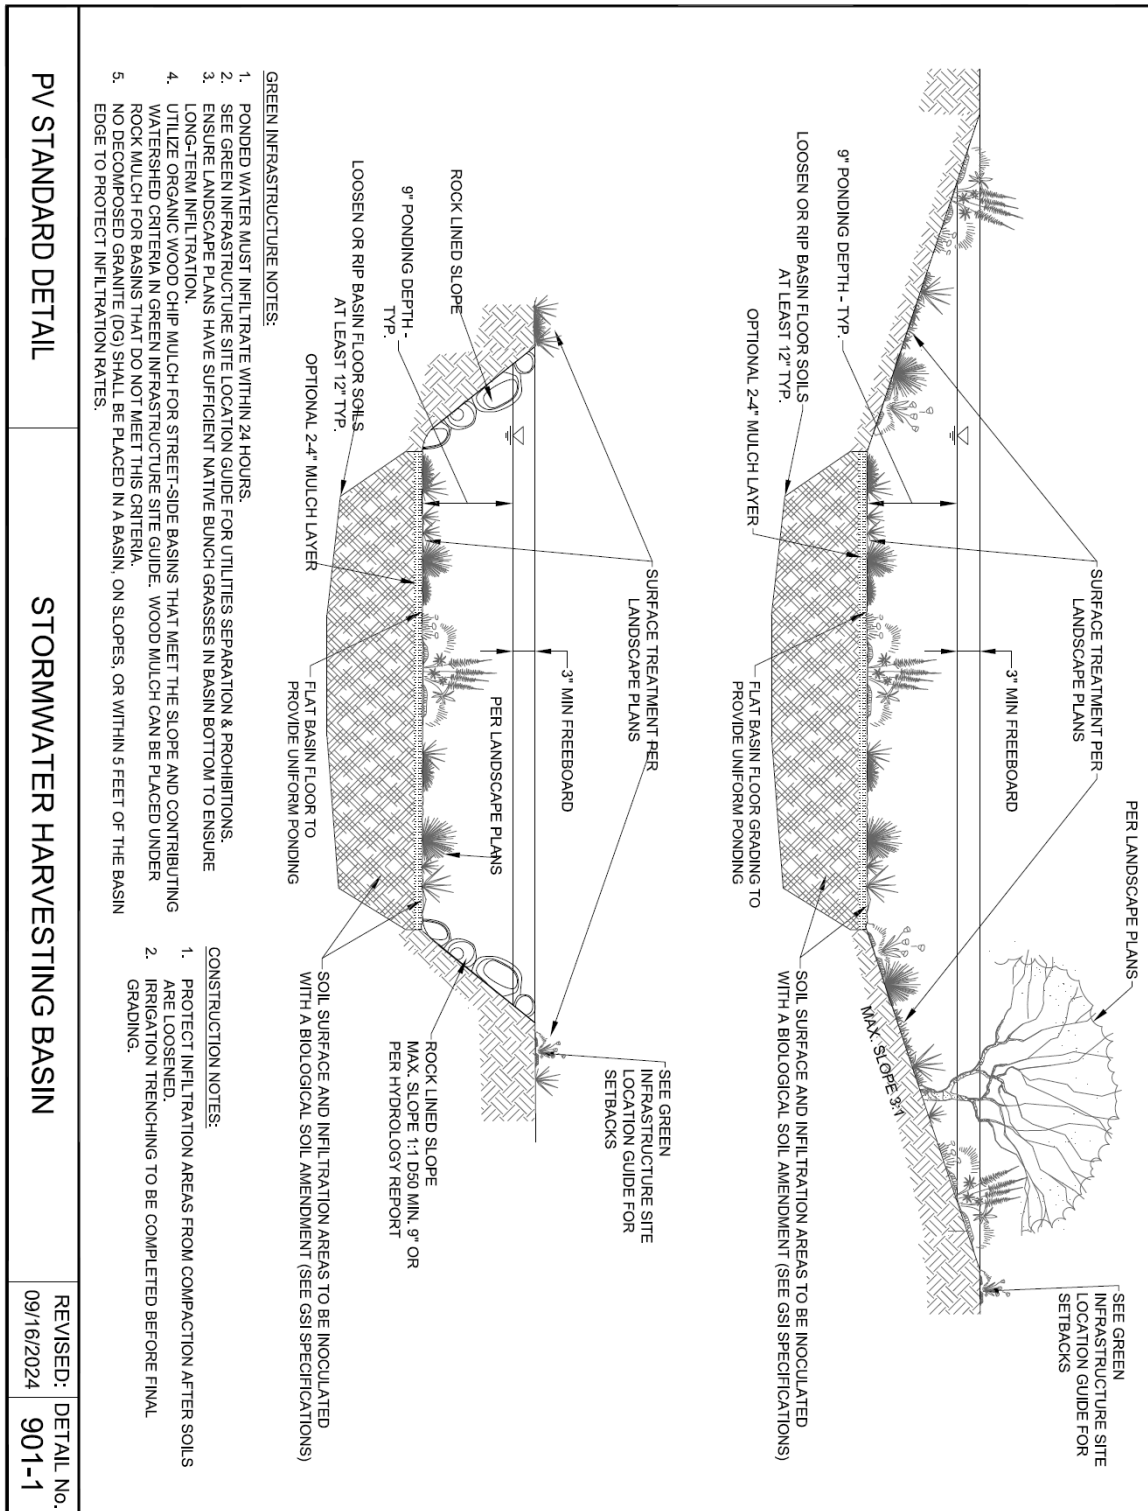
Detail No. 901-1 Stormwater Harvesting Basin
